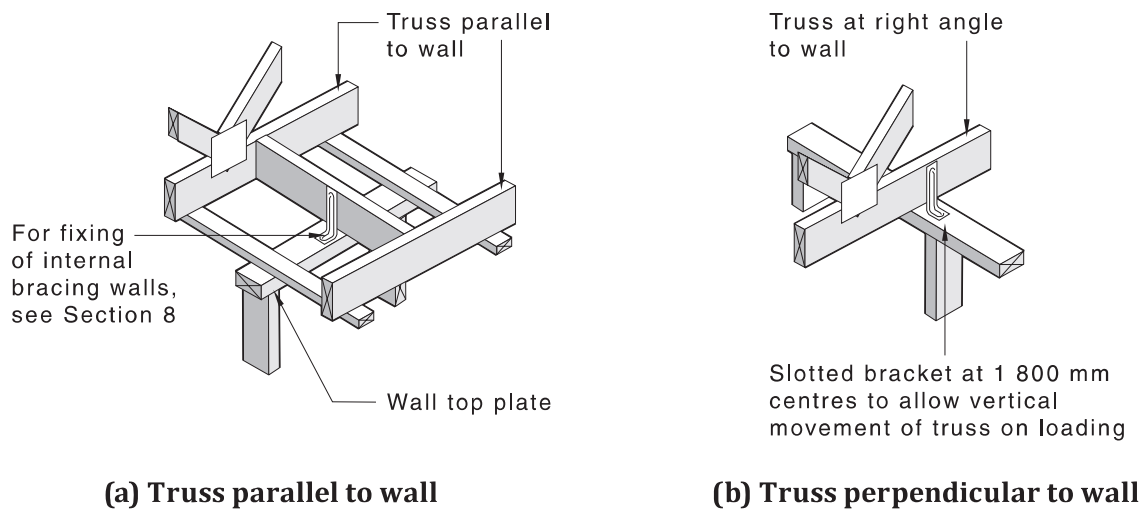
Fixing of trusses to a non-loadbearing internal wall
